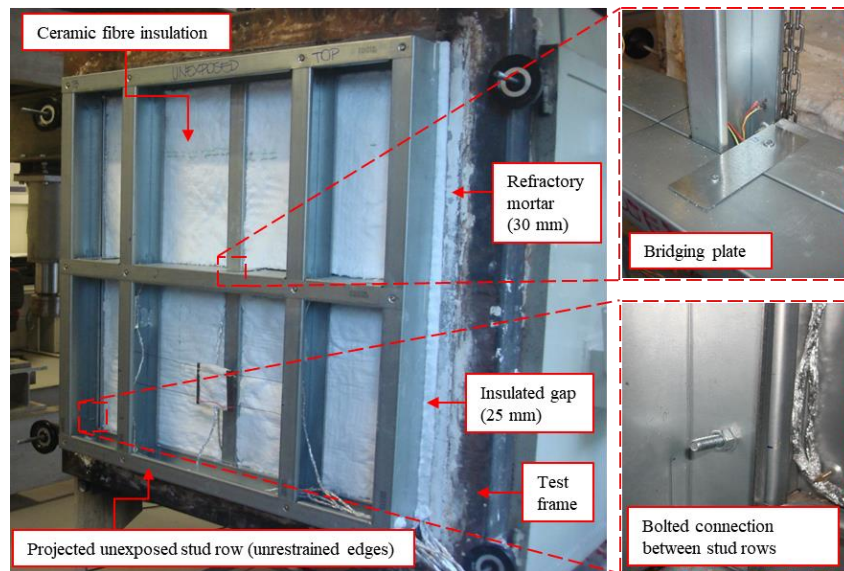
Furnace apparatus, test frame and connection details of the steel frame (specimen 5).
